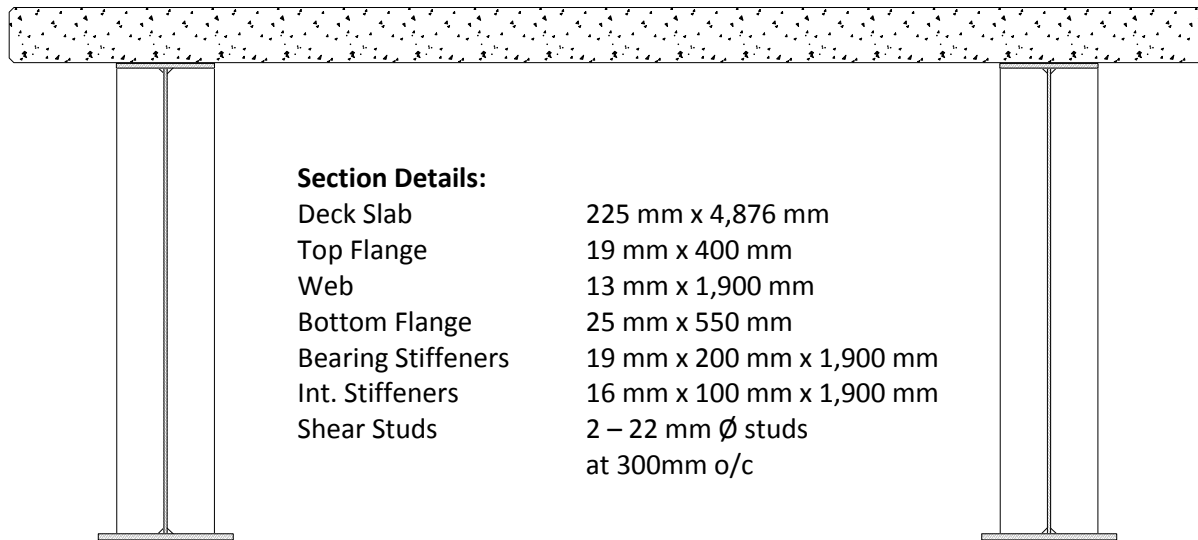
Cross-Section for a 36m L165 Composite Bridge Girder
